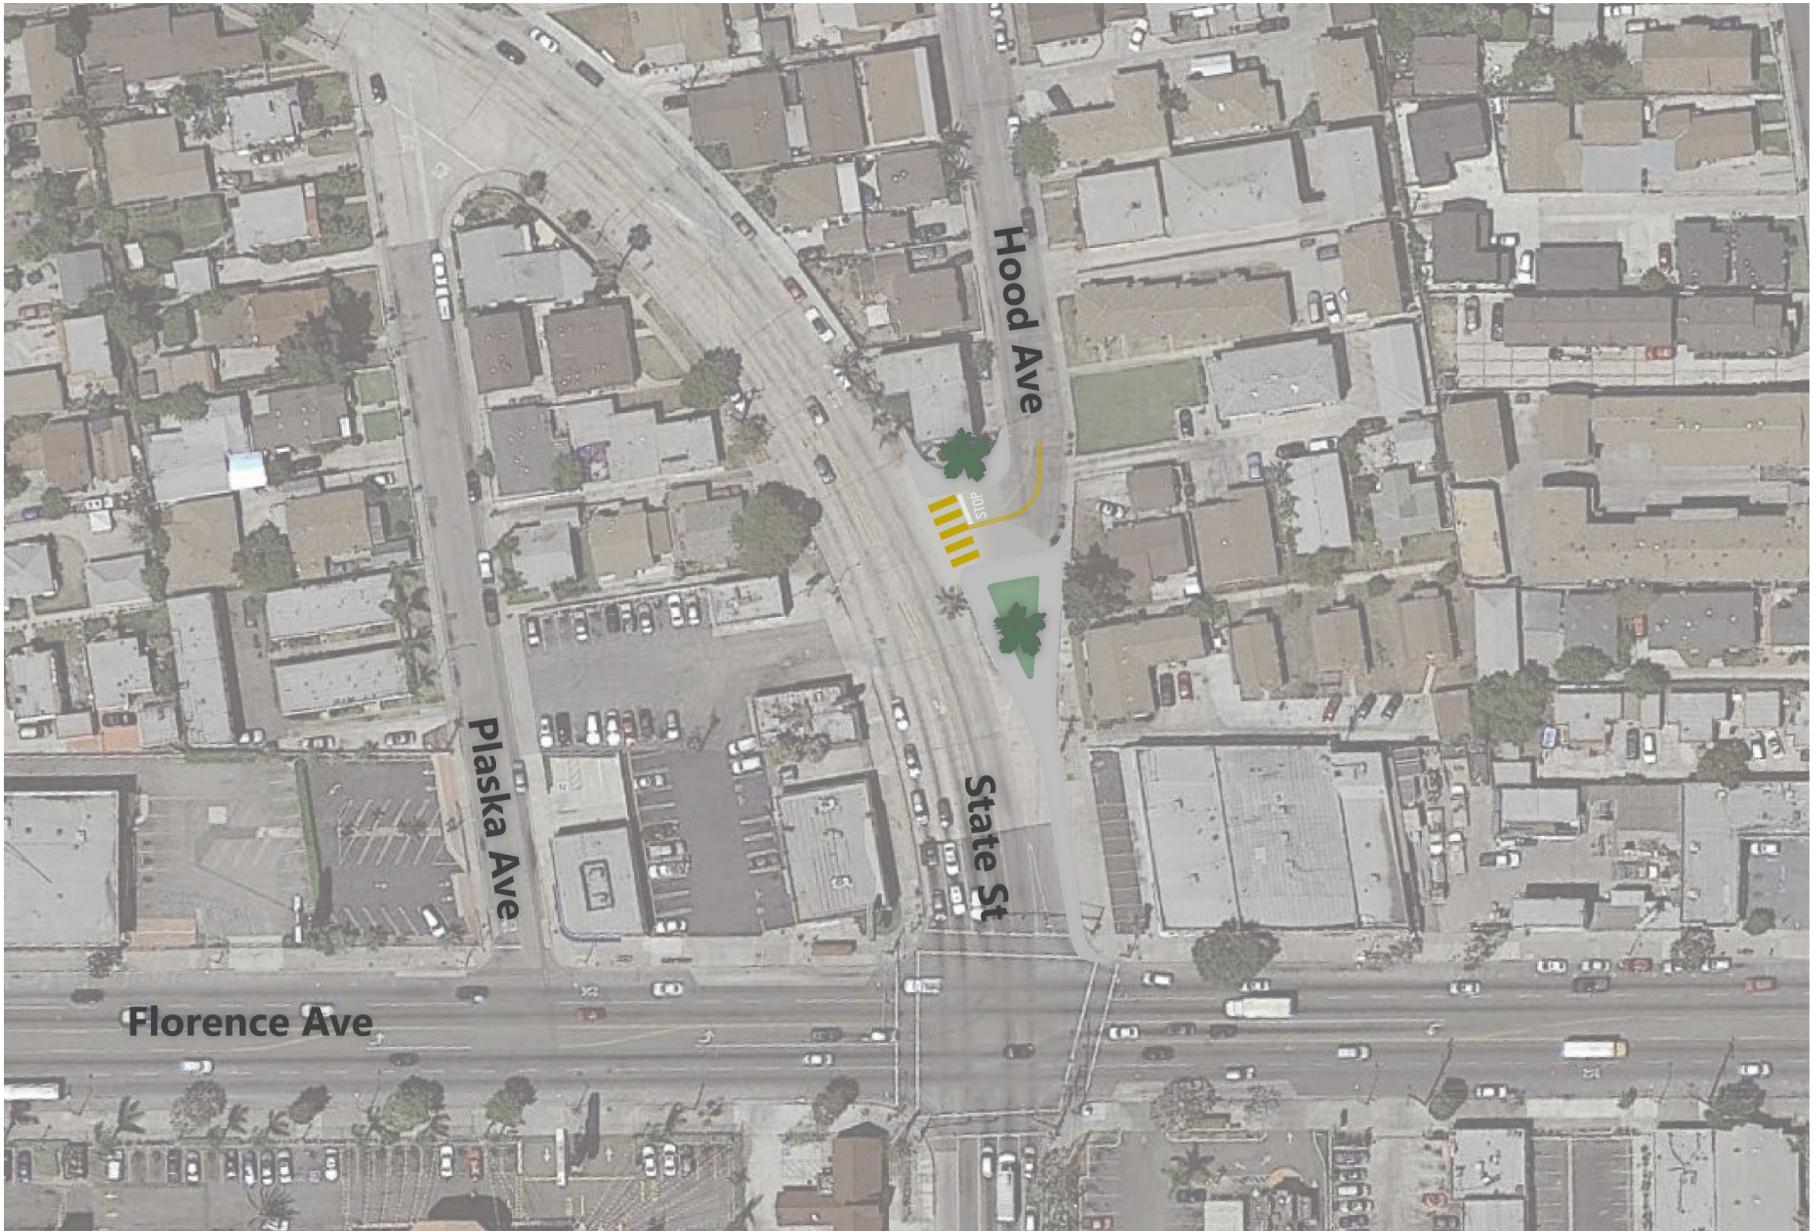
STATE STREET AND HOOD AVENUE CONCEPT PLAN
